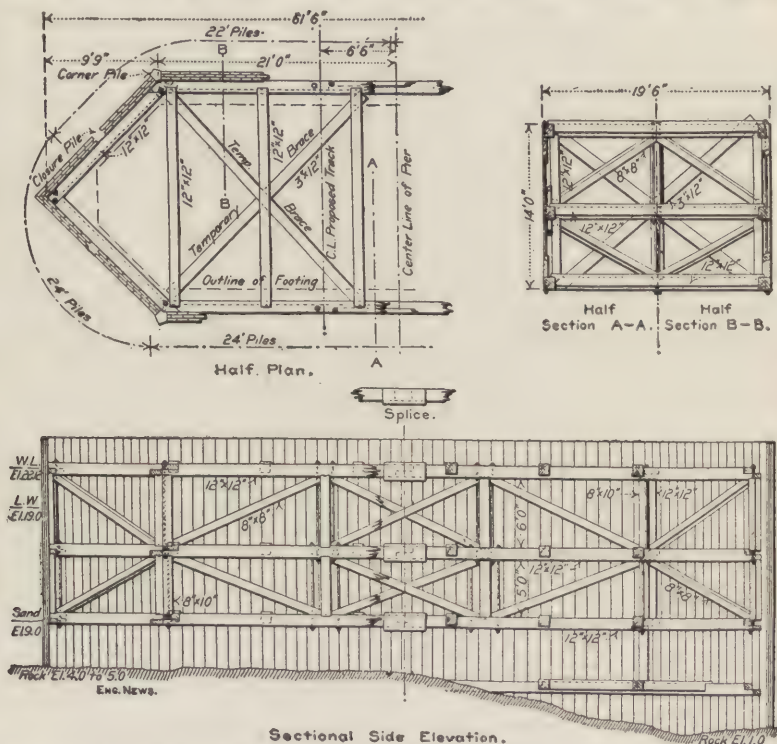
Cofferdam for Pier of Chicago, Milwaukee, and St. Paul Railway, Kilbourn, Wis.
